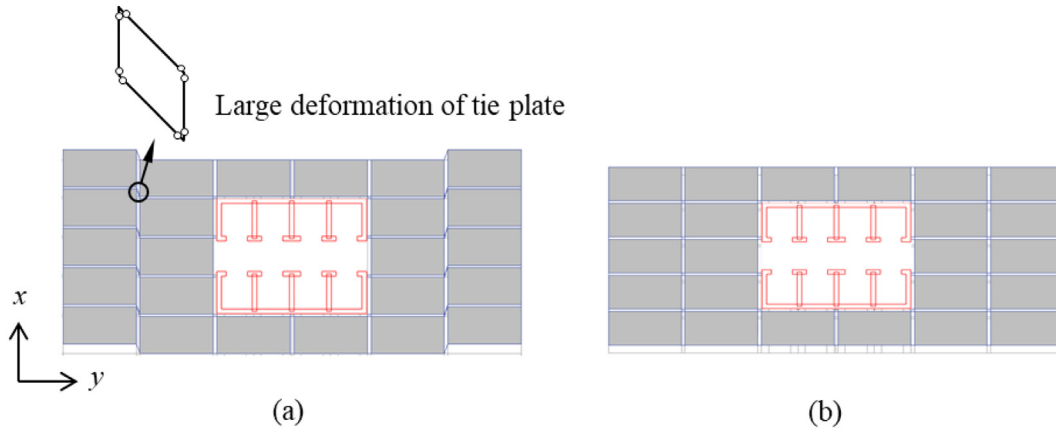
Plan view of building deflection under wind load X-direction for case with (a) flexible tie plate and discrete rigid diaphragms, (b) enough capacity of tie plate.
